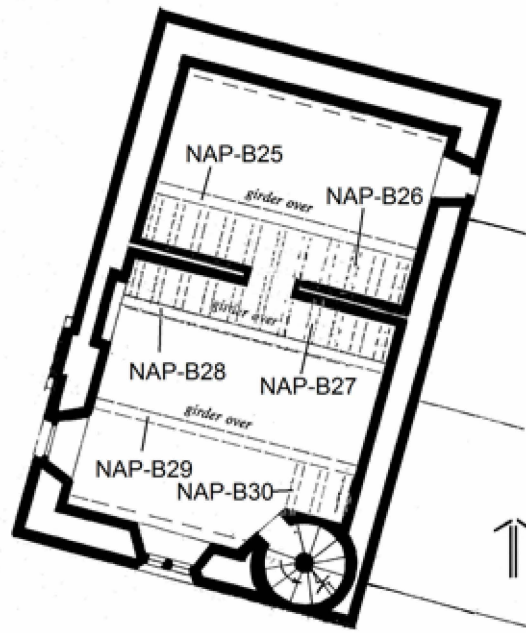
High-end tower, west tower, first-floor plan showing the location of samples NAP-B25–30 (John Warren)
